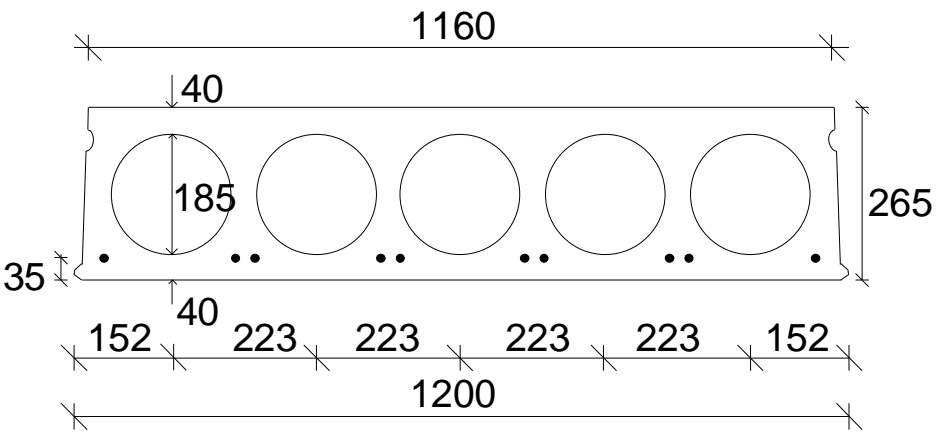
PC beam. Manufacturing drawing by Oy Lohja CAD Ab.
